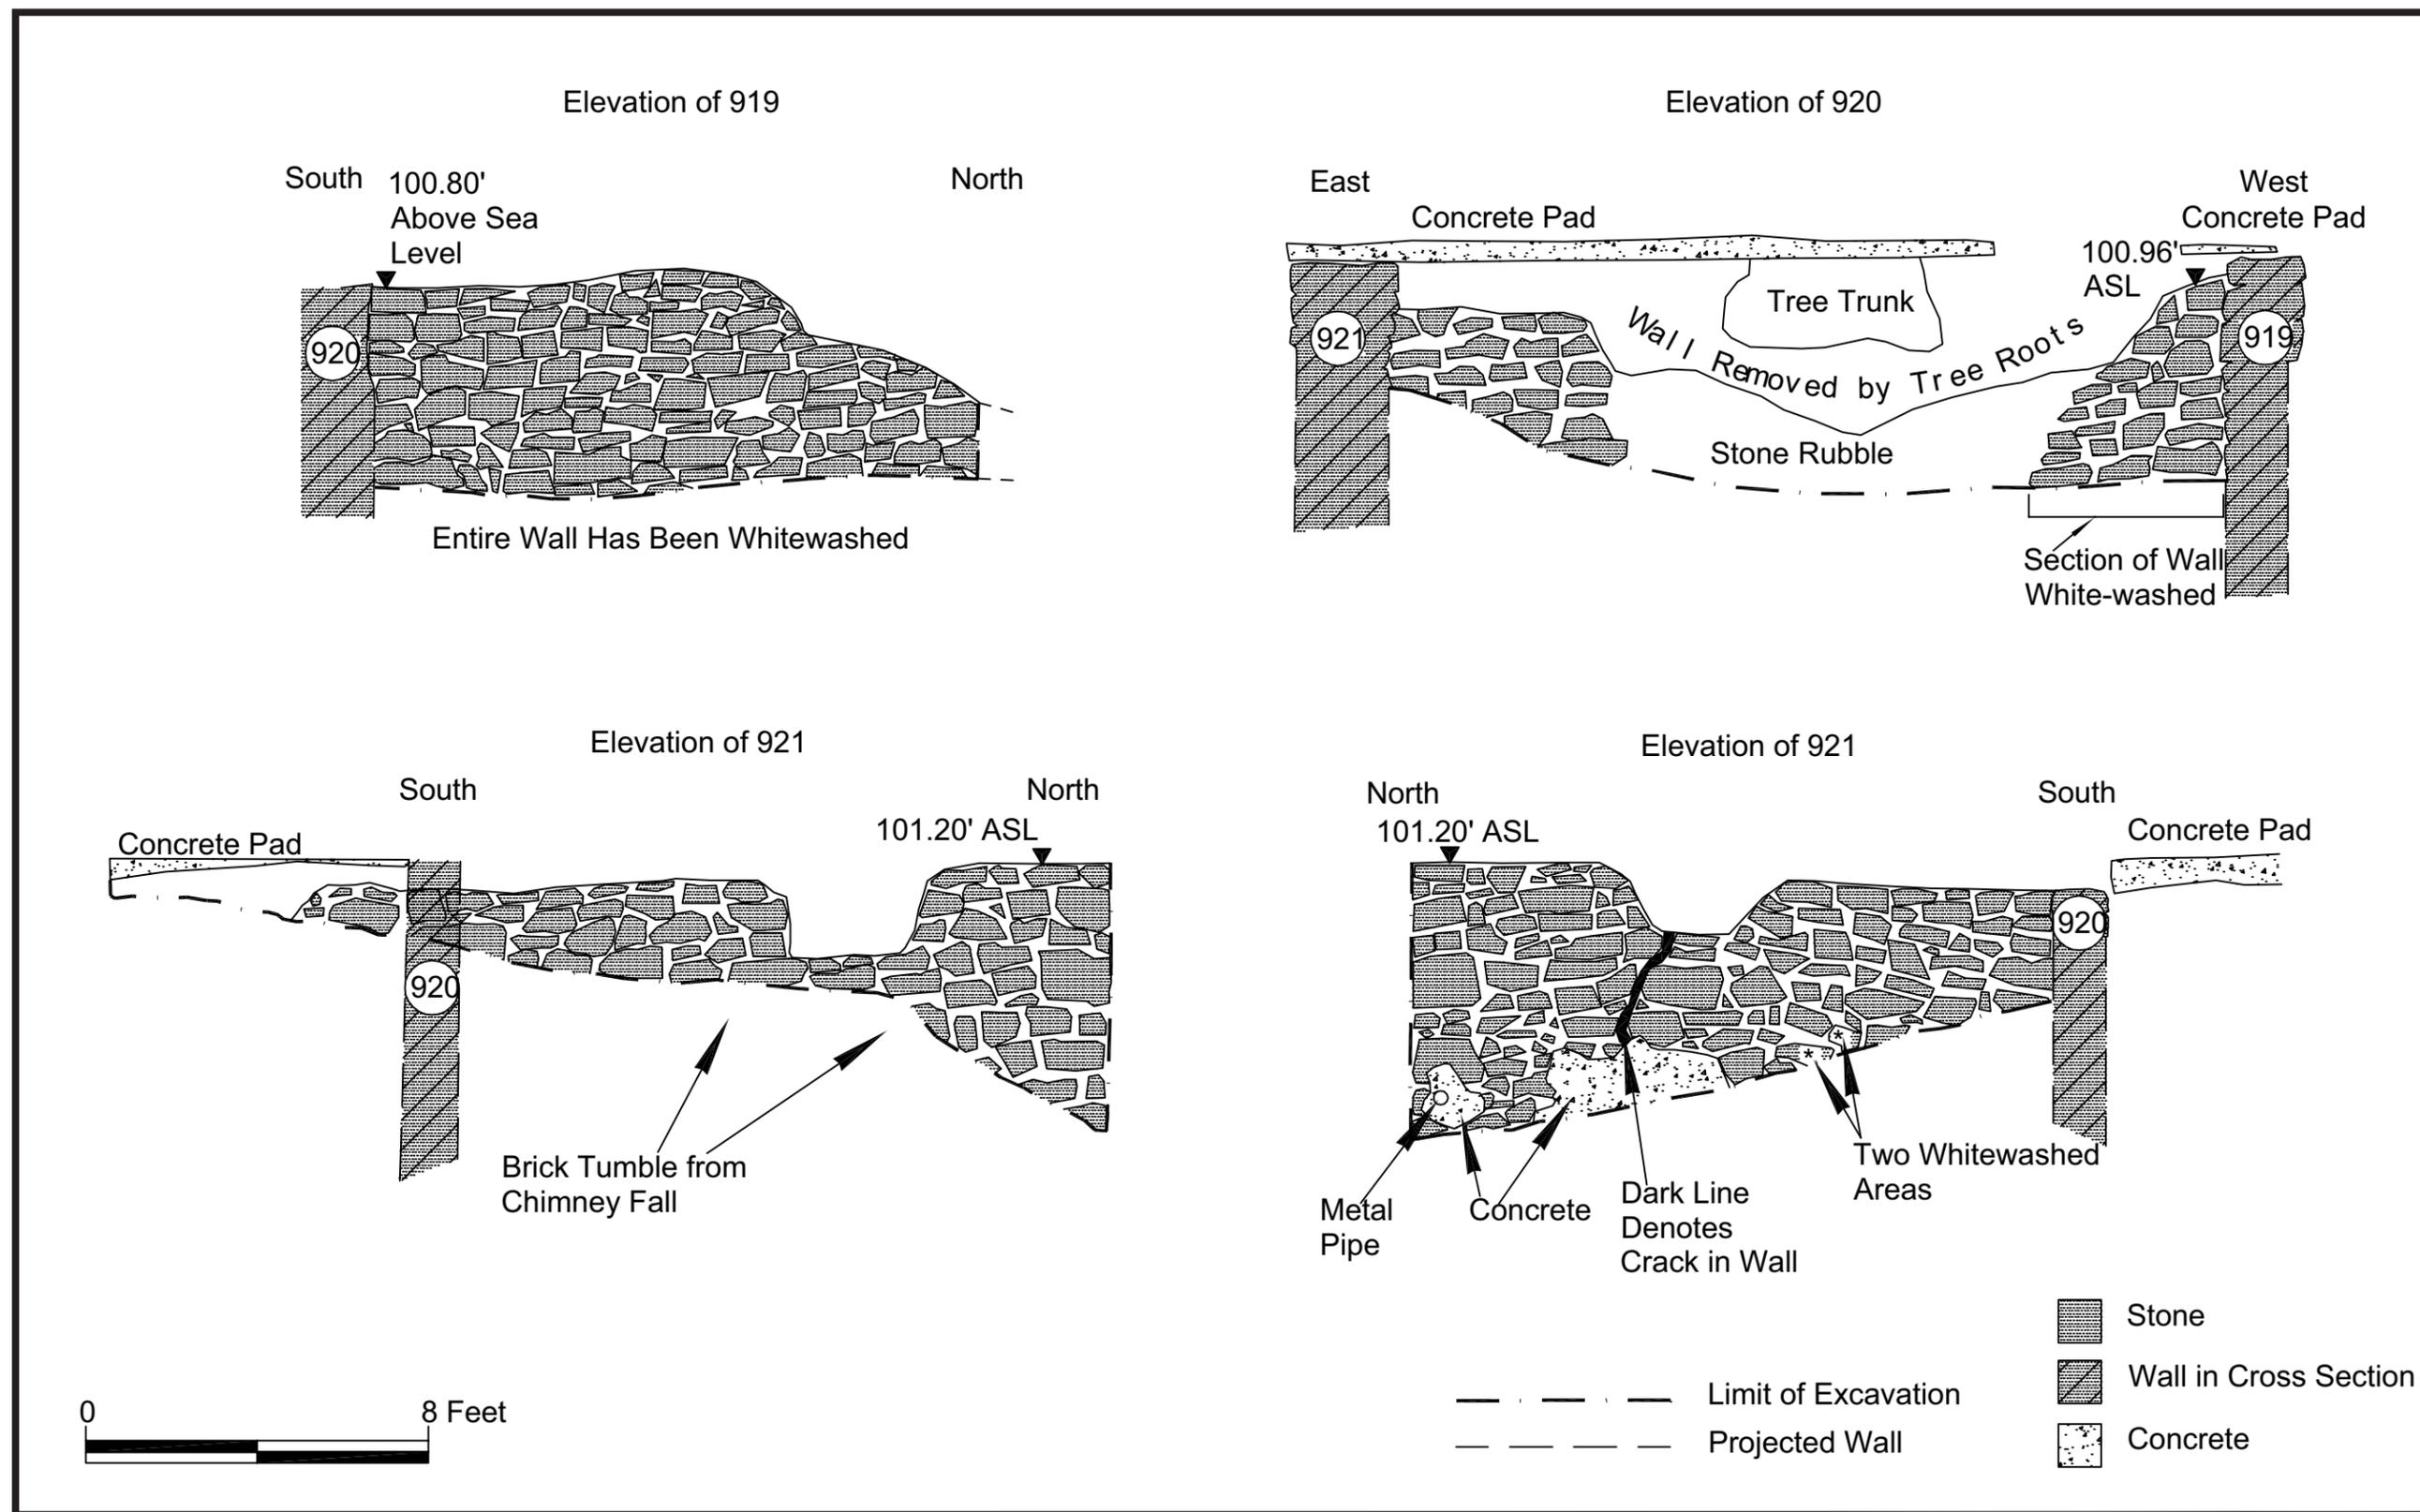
Profiles of Ward/Little House Walls; Contexts 919E, 920N, 921E, and 921W.
